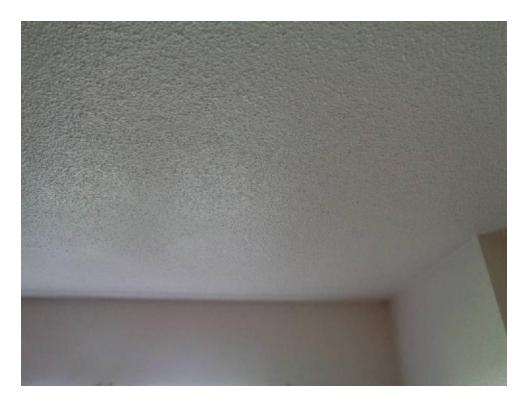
View of white ceiling texture (CTA, asbestos containing) from Unit C of 9842 Oak Place Court.
